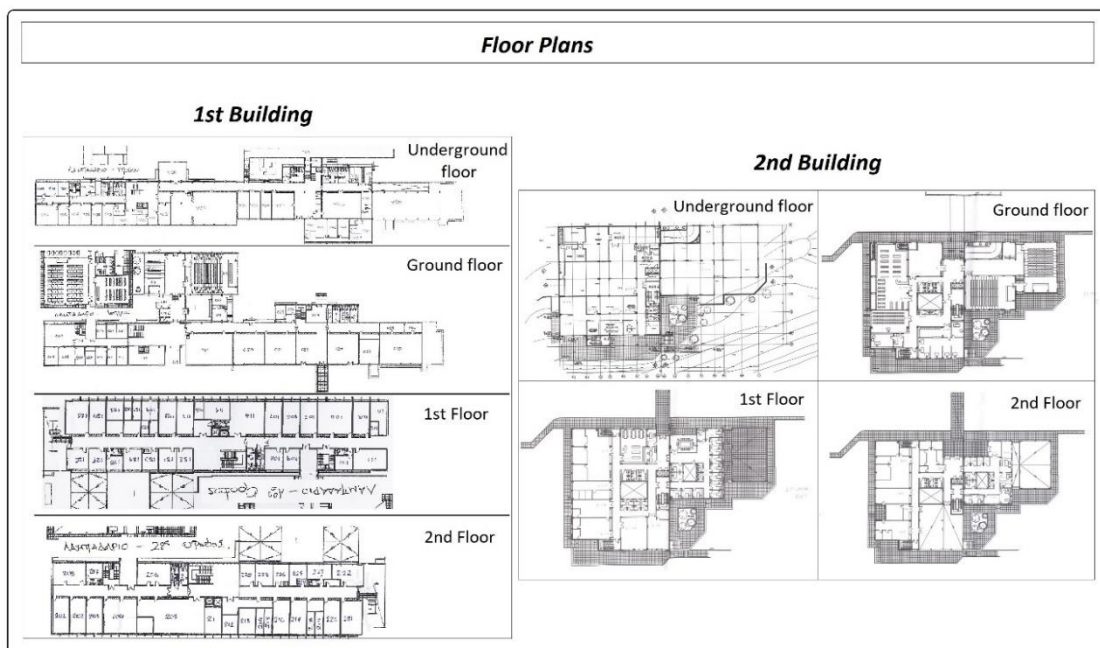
Floor plans of the underground floor, the ground floor, first floor and second floor of the 1st (left) and the 2nd (right) building, at the scale of 1:200.
